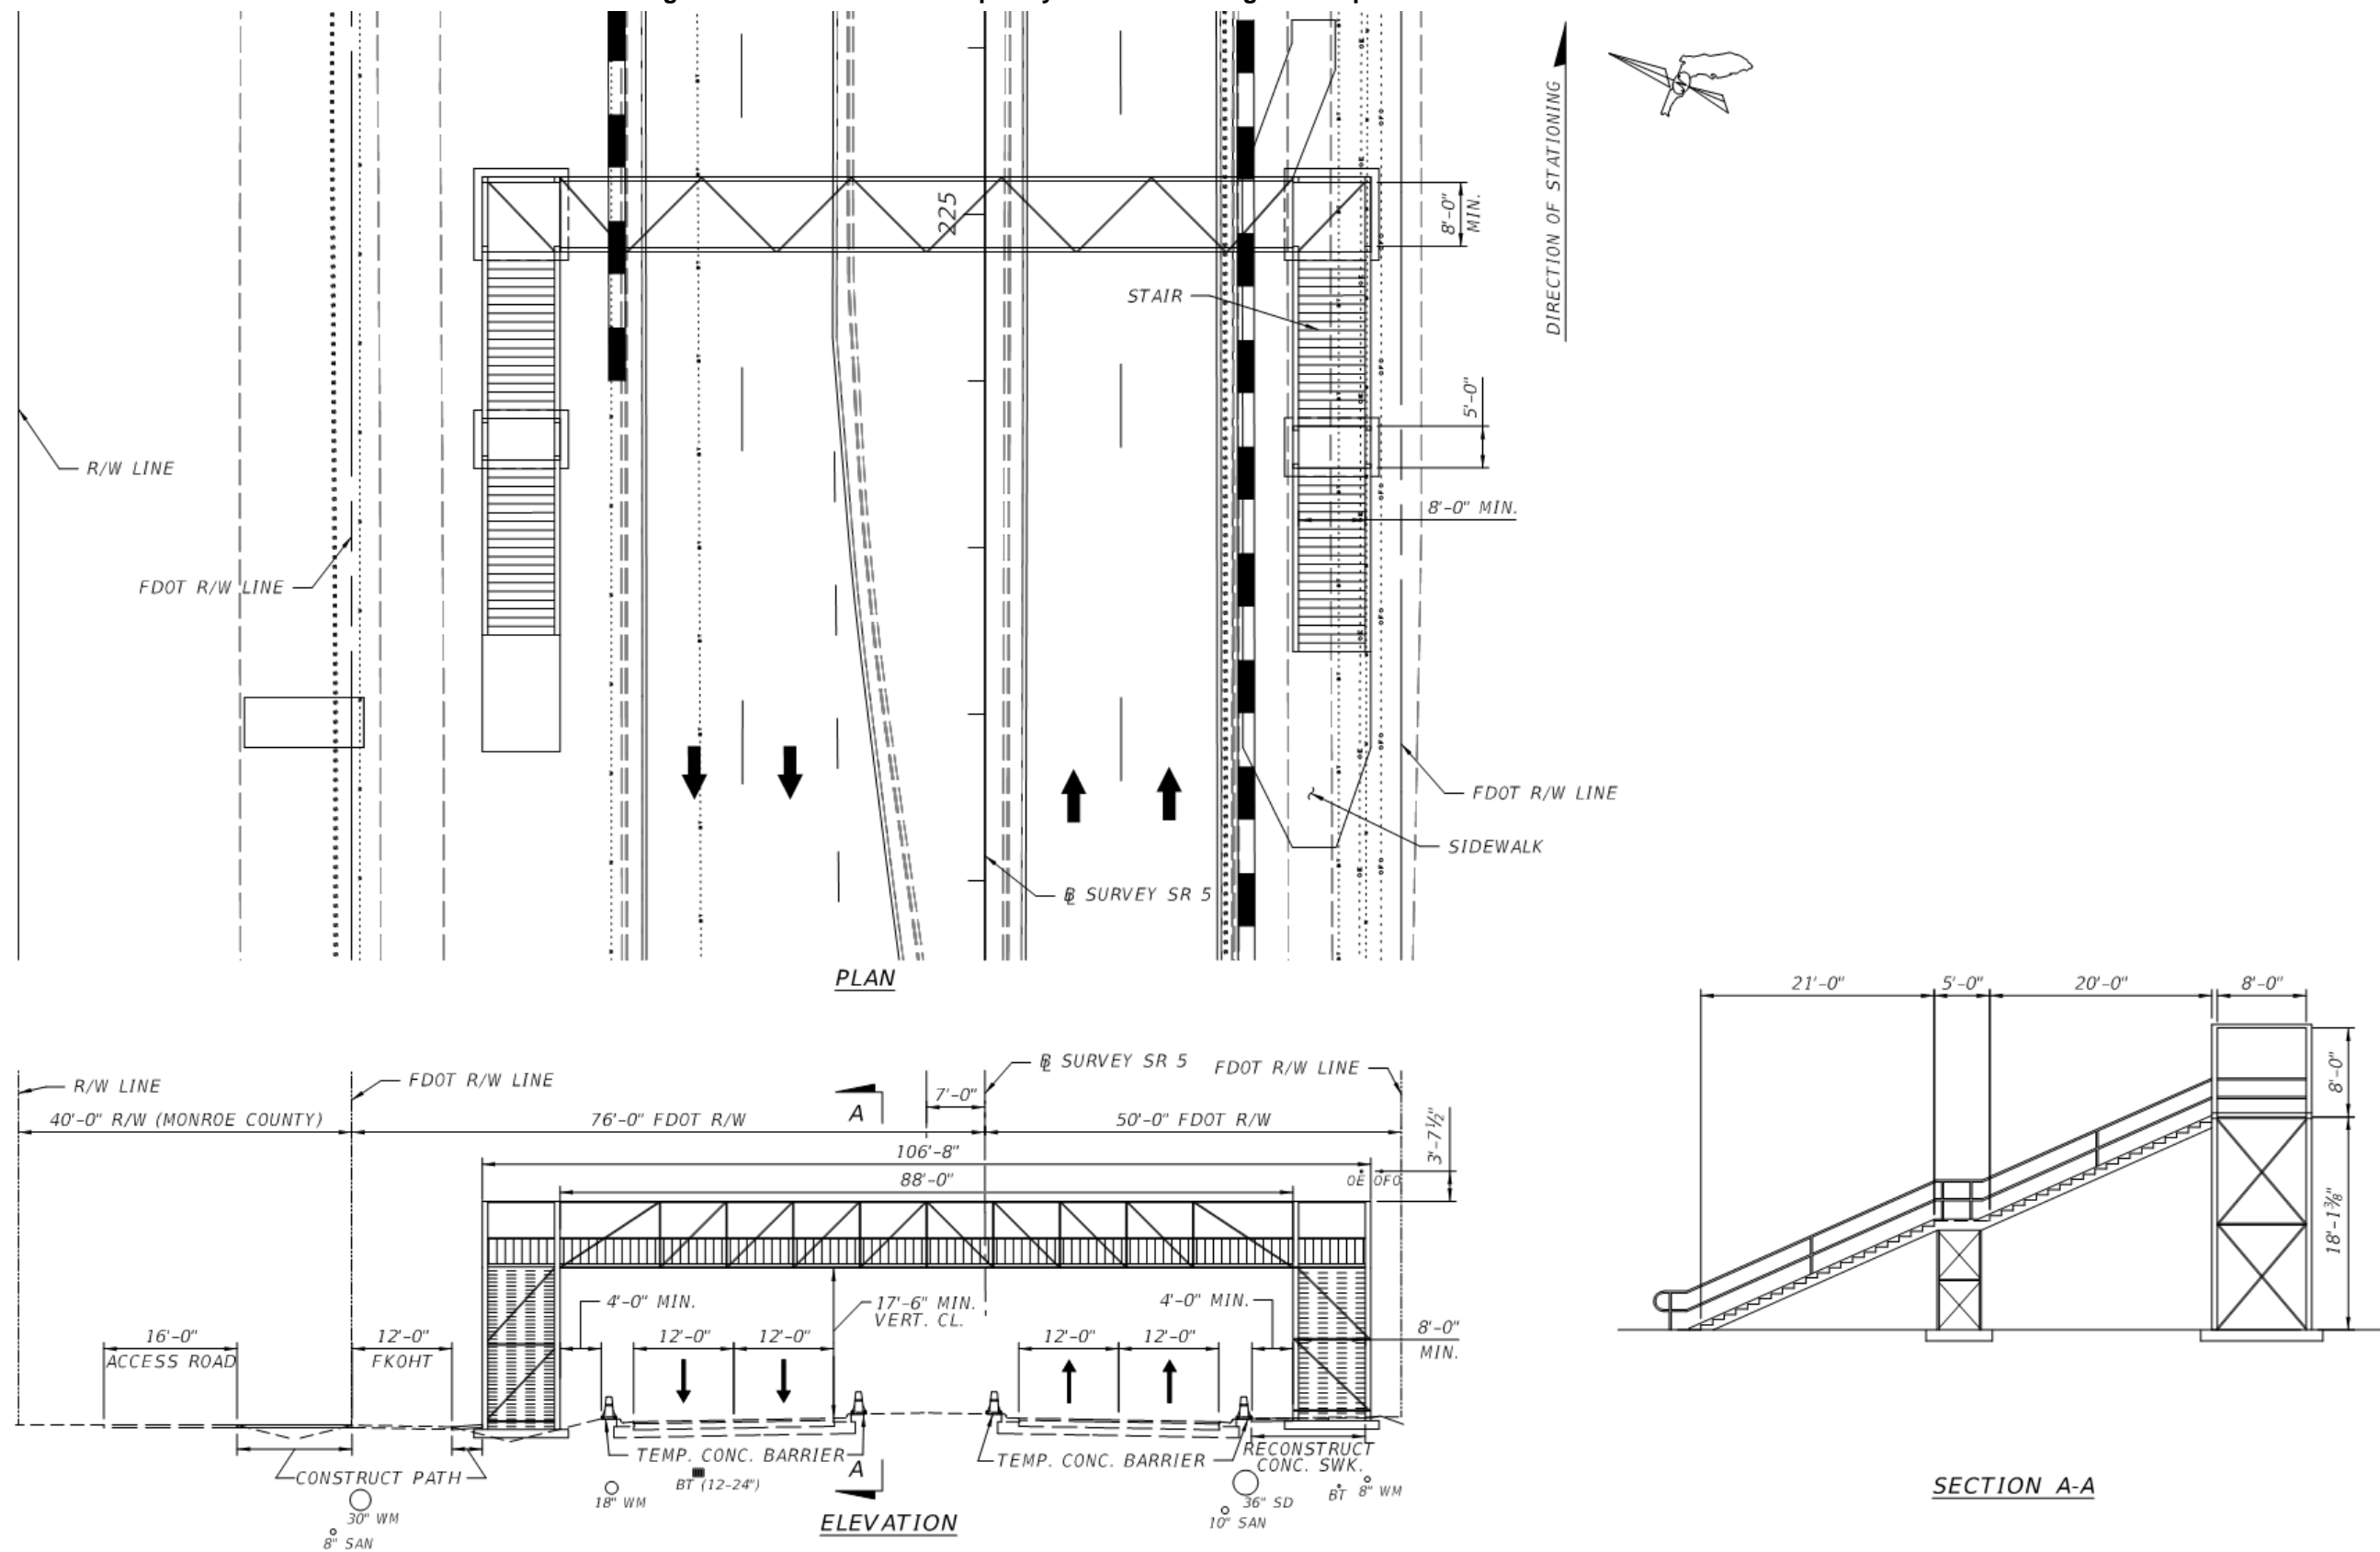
Location 5 Temporary Pedestrian Bridge Concept – Structural Plan & Elevation
